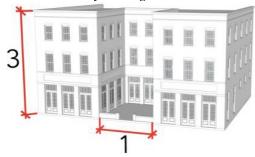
Minimum Building Frontage Occupation with Open Space
